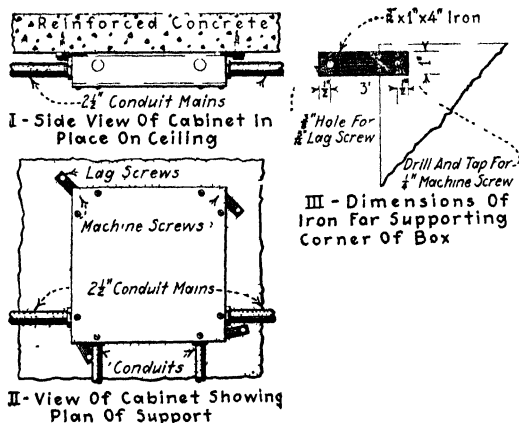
Scheme for supporting a pull box from a reinforced-concrete ceiling.
